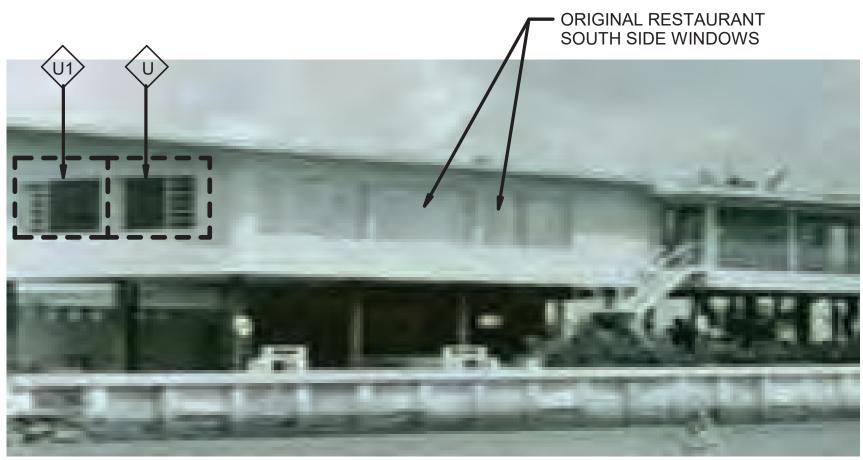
SOUTH AND EAST ELEVATION WITH ORIGINAL RESTAURANT WINDOWS
